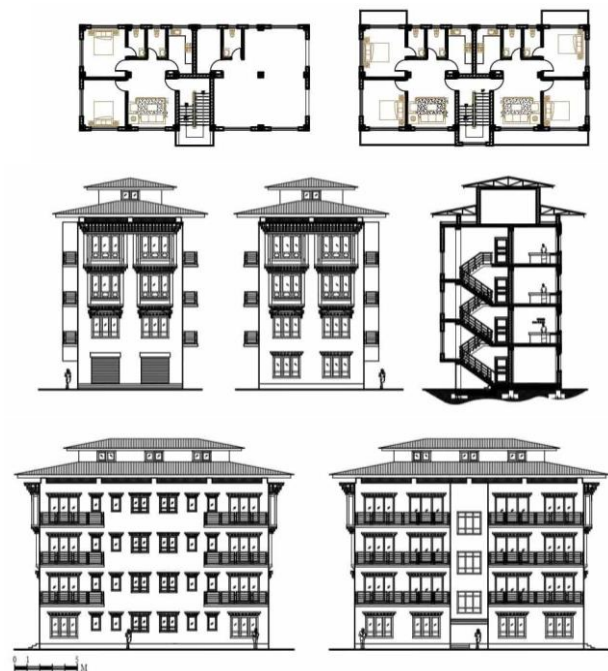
Plans, a section and elevations of case study building. Top row. left: Ground floor plan. Right: Typical floor plan. Middle row. Left & Middle: Side elevations. Right: Section. Bottom row: Elevations.
